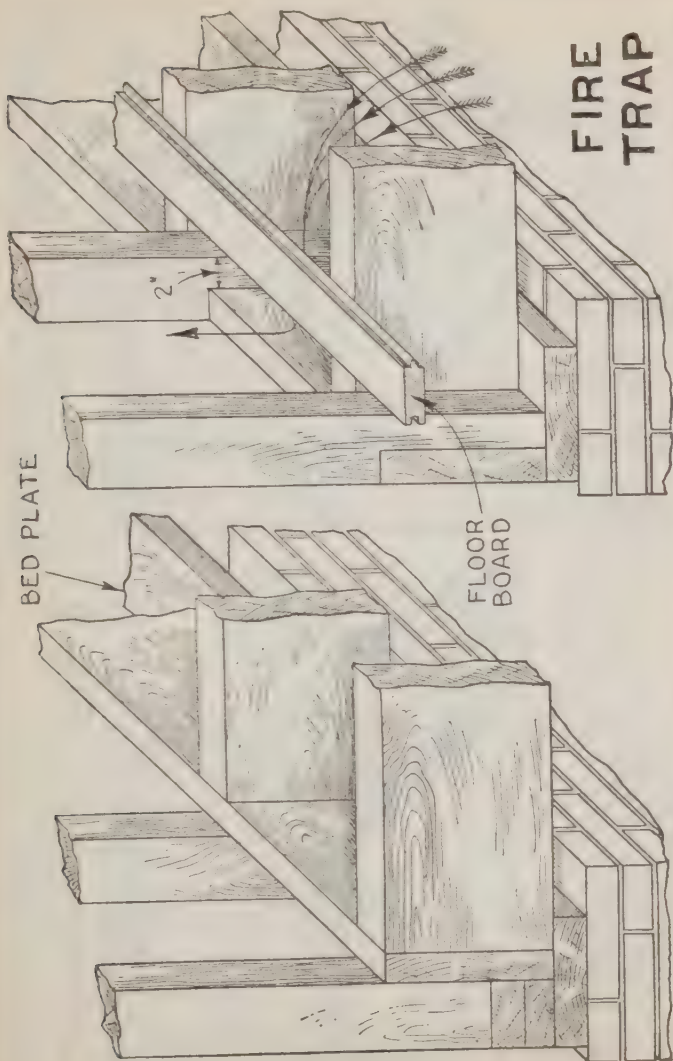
,809.—Built-up T sill with combination three-piece bed plate, and beam spaced for external studs. The bed plate is reinforced by two layers of studding laid along the outside edge and forming a stiff footing for the wall studs.
